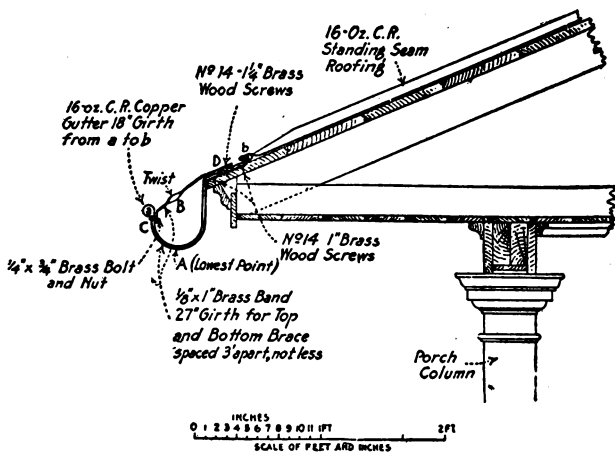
Detail of Gutters Over Extension and Porch Roofs
